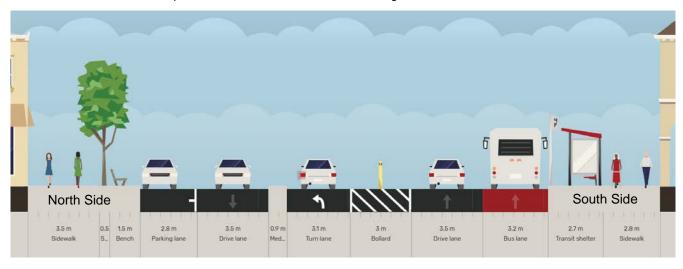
Option 2 Cross-section at First Street, Looking East
